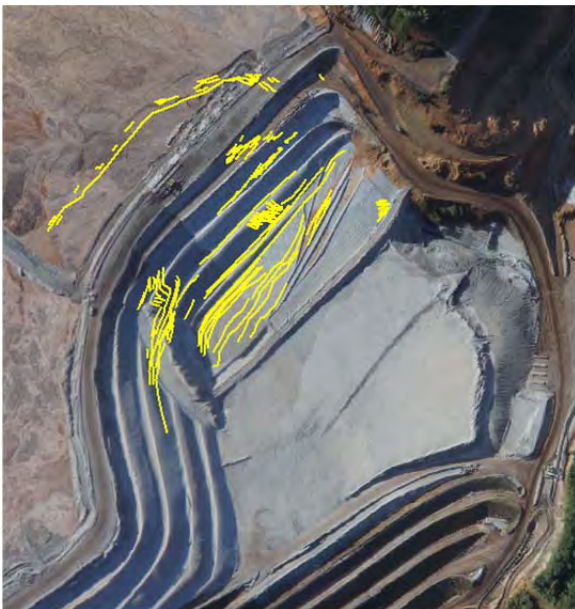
August 27, 2014 cracking at left abutment setback
